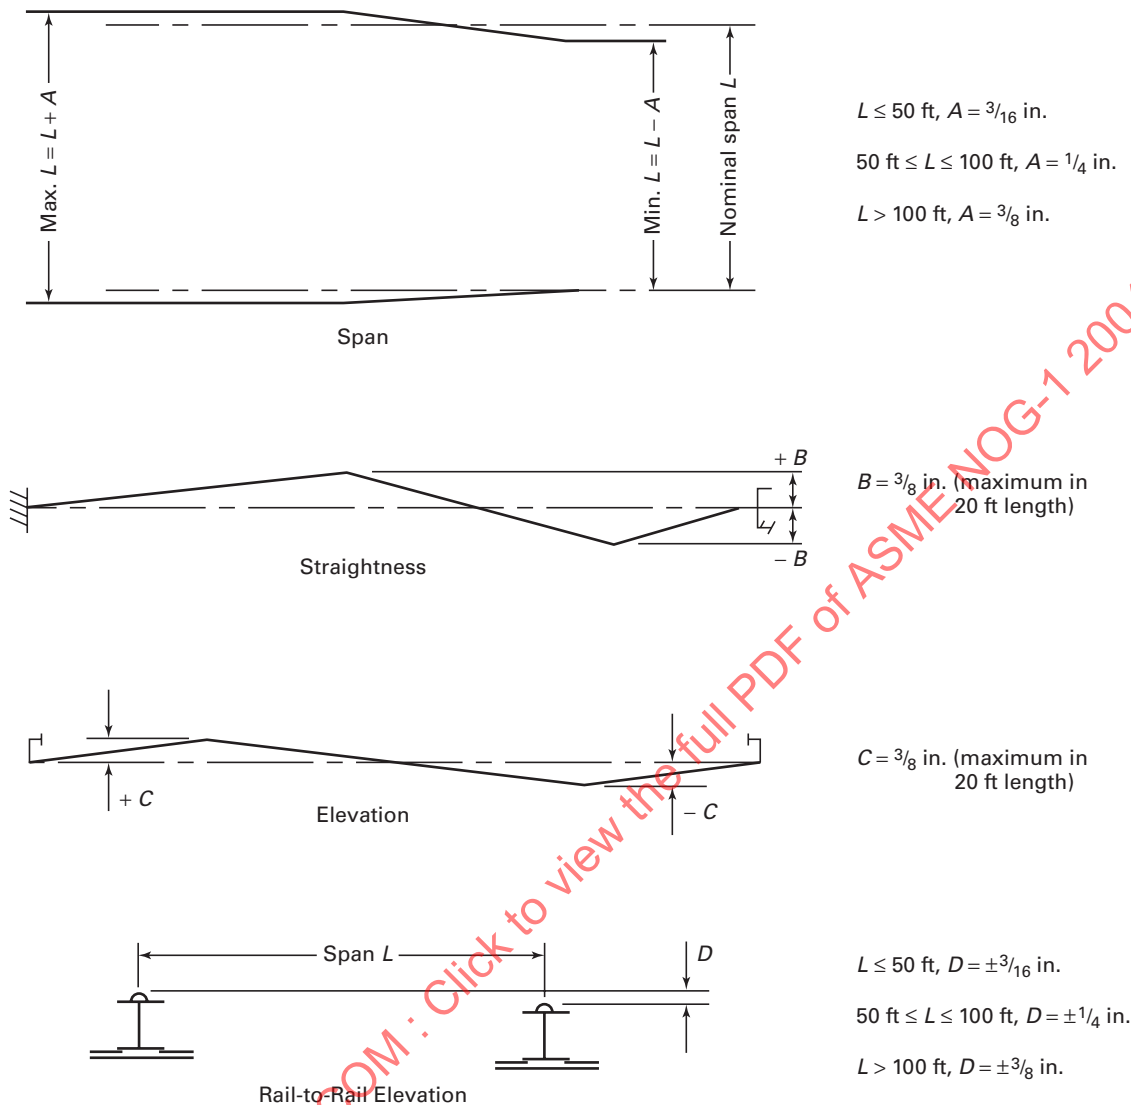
Runway Rail Alignment Tolerance
